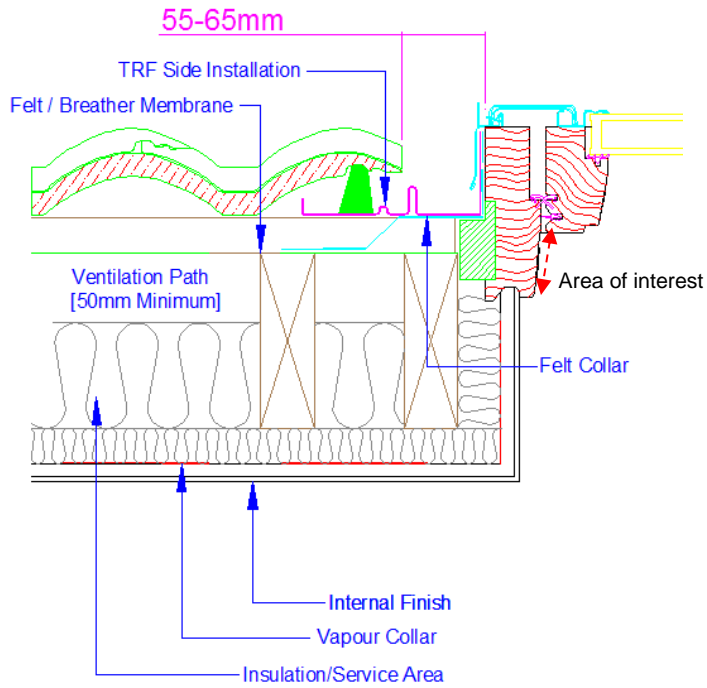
Left hand side of roof window/jamb detail with Keylite Thermal Collar.
